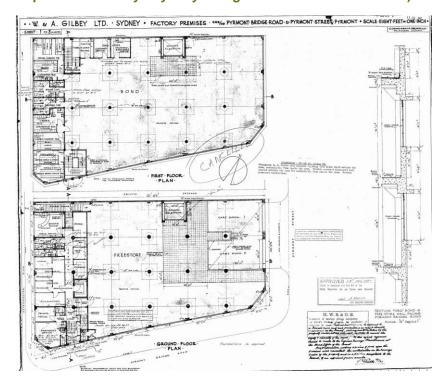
1947 – Ground and first floor plans for the proposed factory premises for W & A Gilbey, by C. Orme, architect, Melbourne, approved 10 July 1947 and amended in 1948 (Source: City of Sydney Archives, Pyrmont Bridge Rd NW cnr & Pyrmont St (adjacent No 135), new building (01/01/1947 - 31/12/1947), [A-00572010]. https://archives.cityofsydney.nsw.gov.au/nodes/view/1437047)
